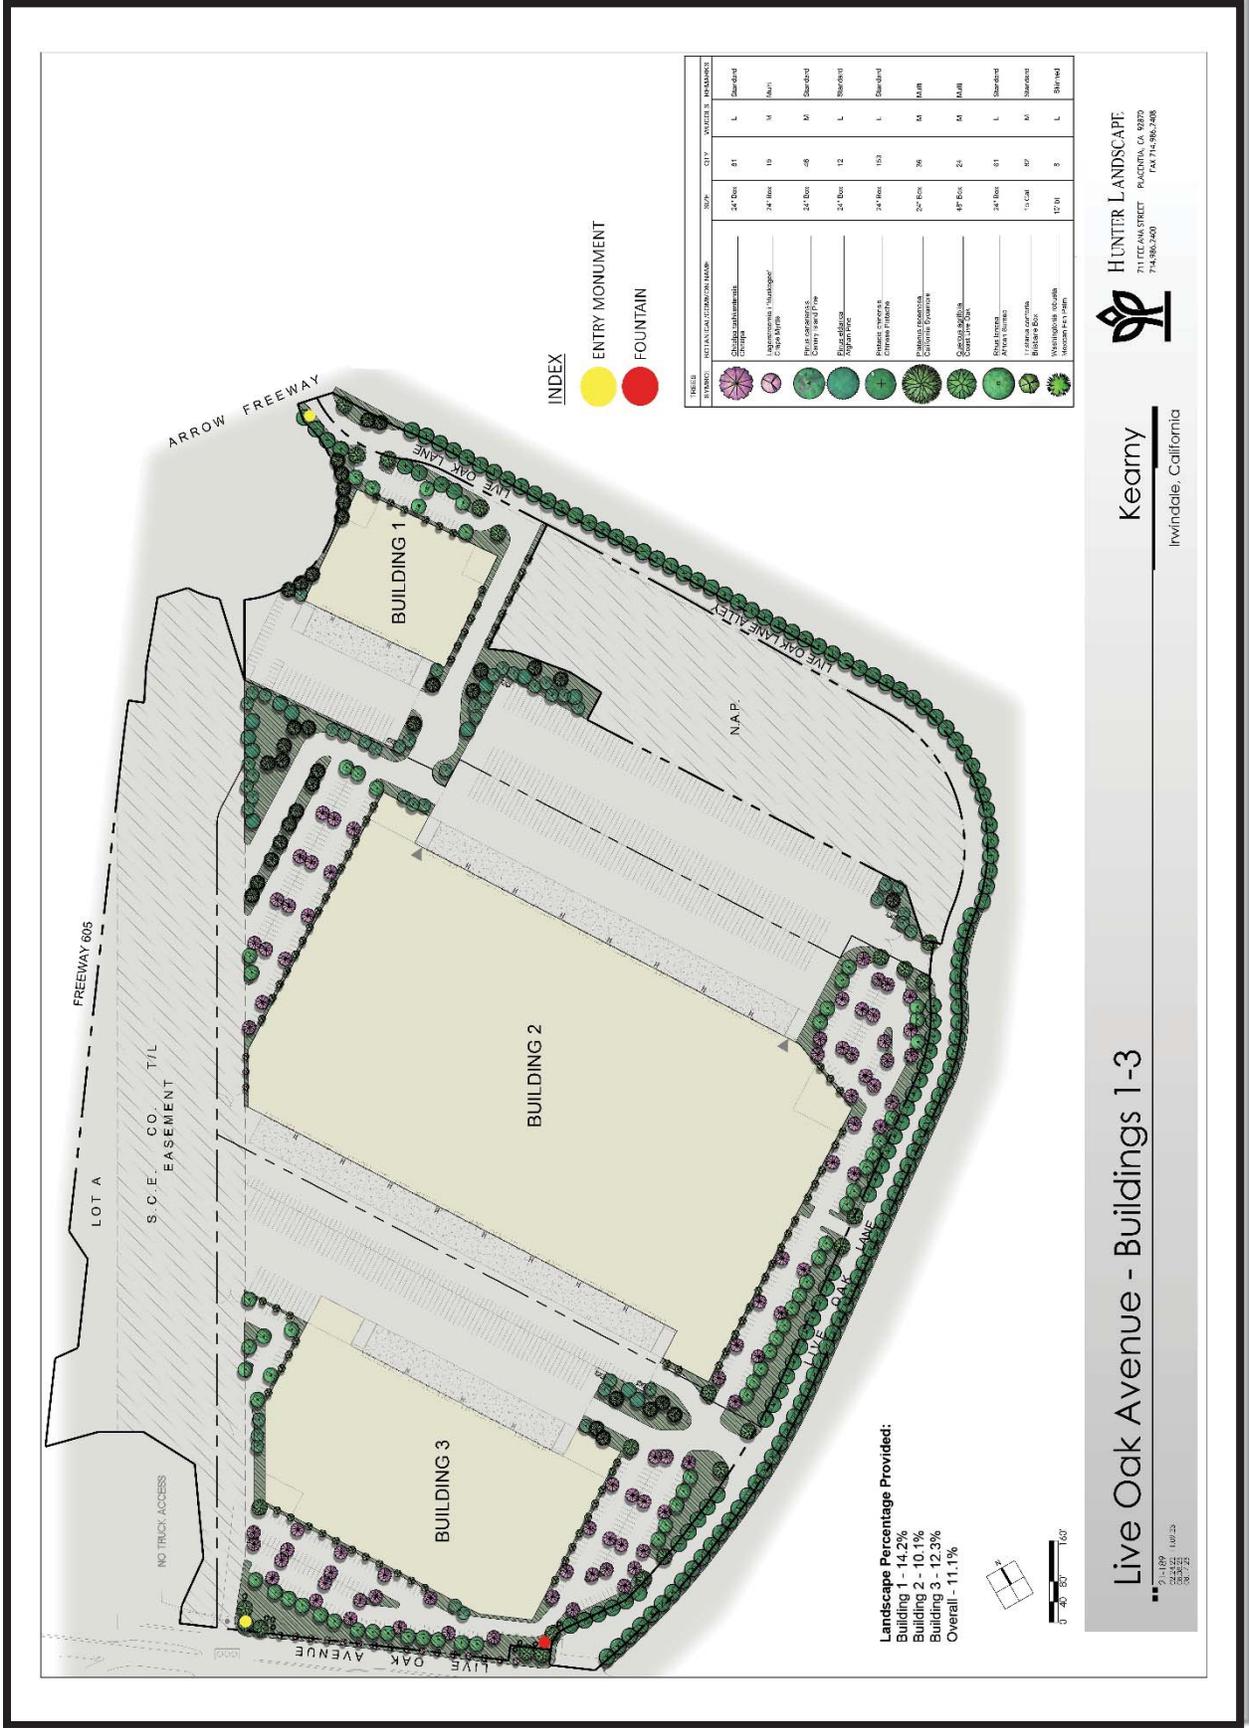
CONCEPTUAL LANDSCAPE PLAN WITHOUT BESS
